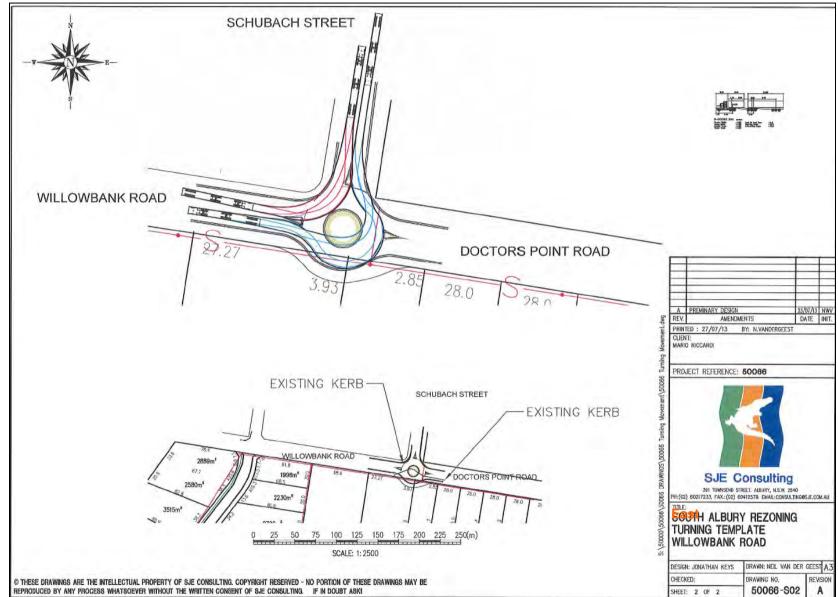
Proposed Roundabout Layout and Turning Swept Path
